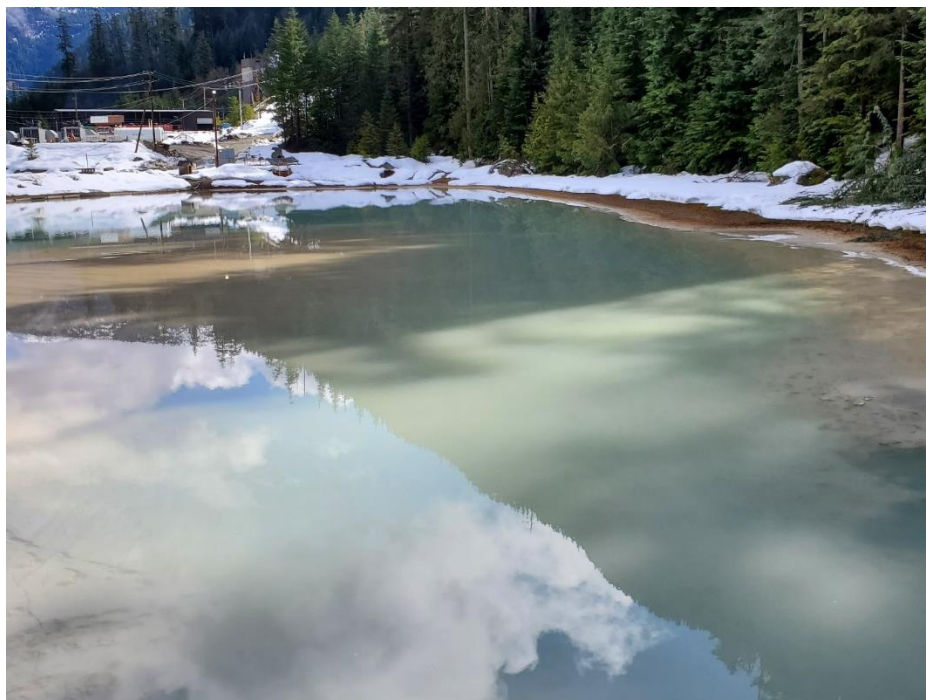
Polishing Pond 1 looking Southeast. (March 23, 2022)
